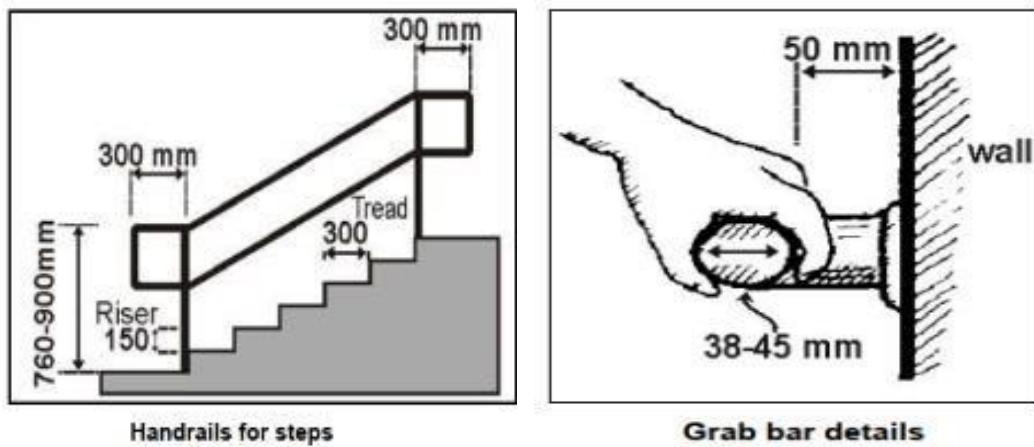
Dimensions of Staircase and placement of the Hand rail
